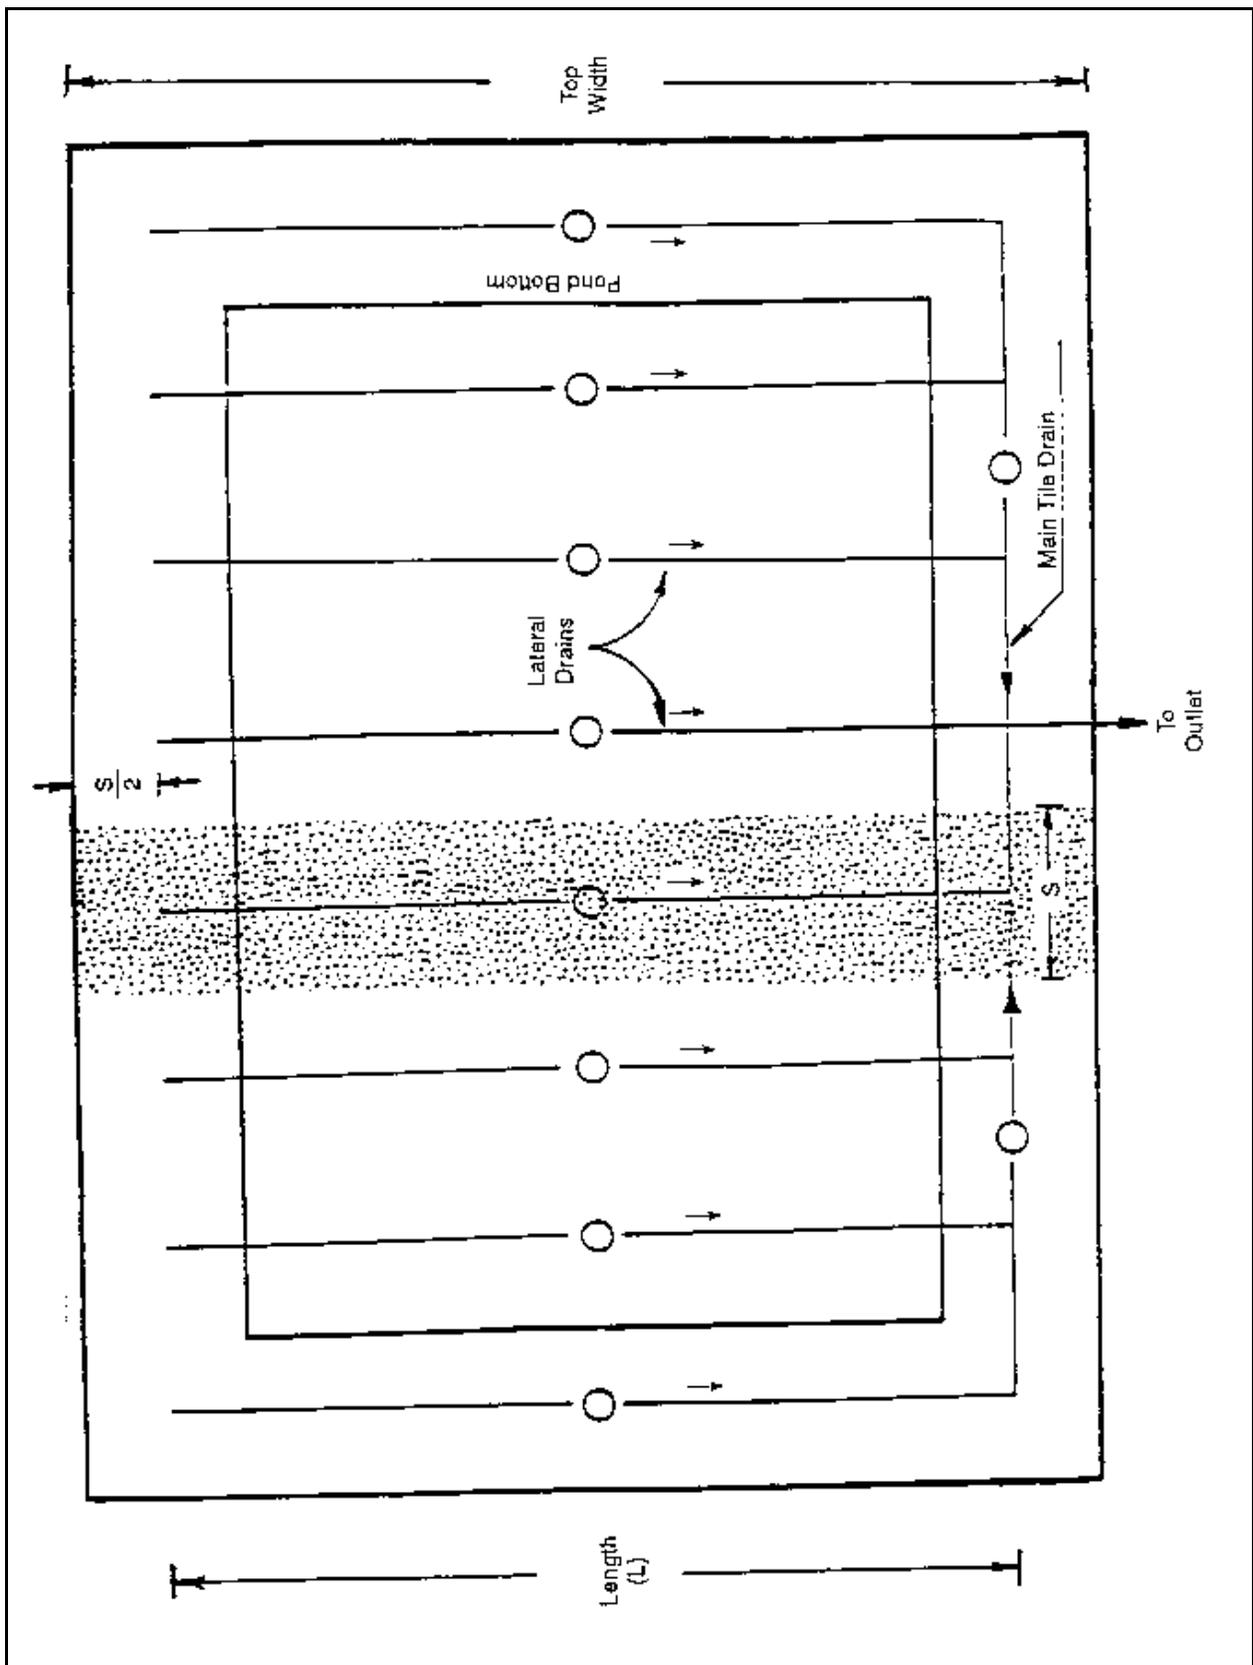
Sketch of Typical Underdrain System Illustrating the Area Served by Laterals.
